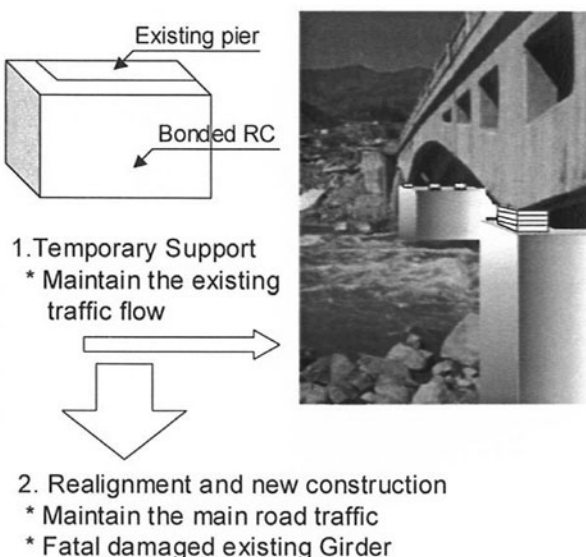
Proposed repairs at Balakot bridge in Pakistan.
